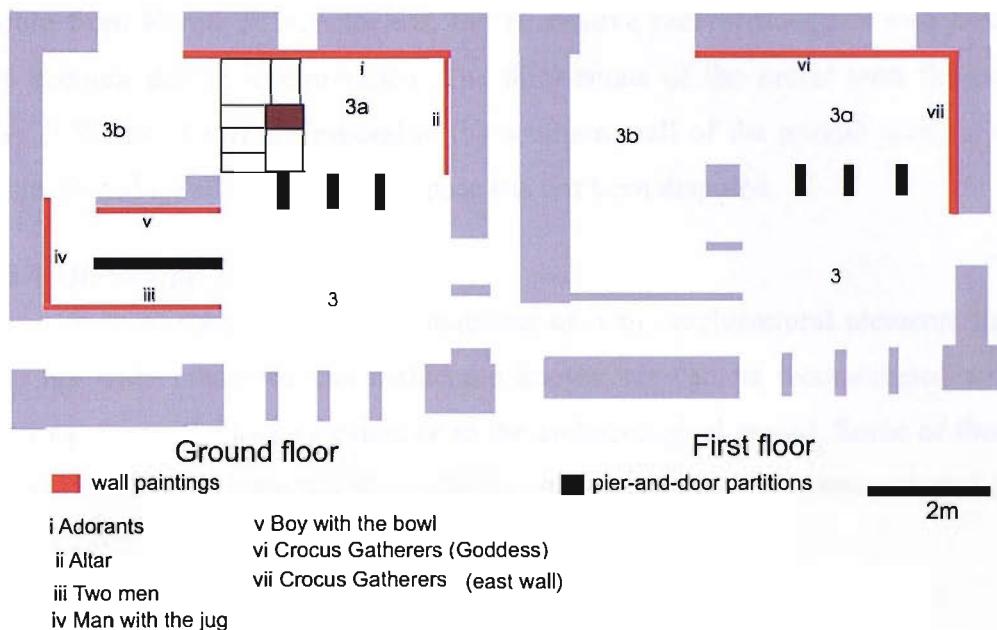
Plans of the ground and first floor of Room 3 in Xeste 3 with indication of the position of the restored wall paintings in the room.
